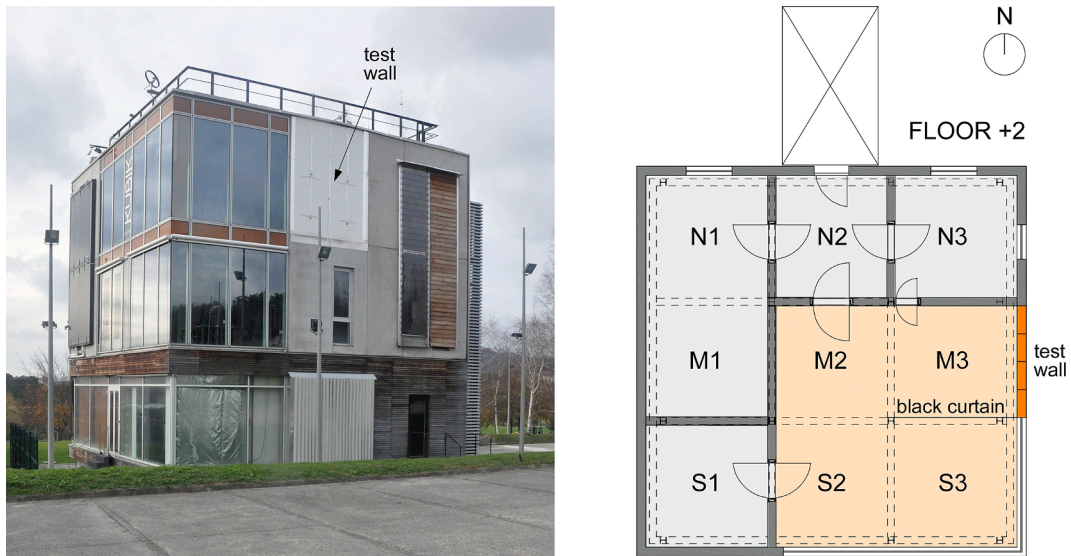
External view (left) and plan (right) of placement of concrete panels in the building.
